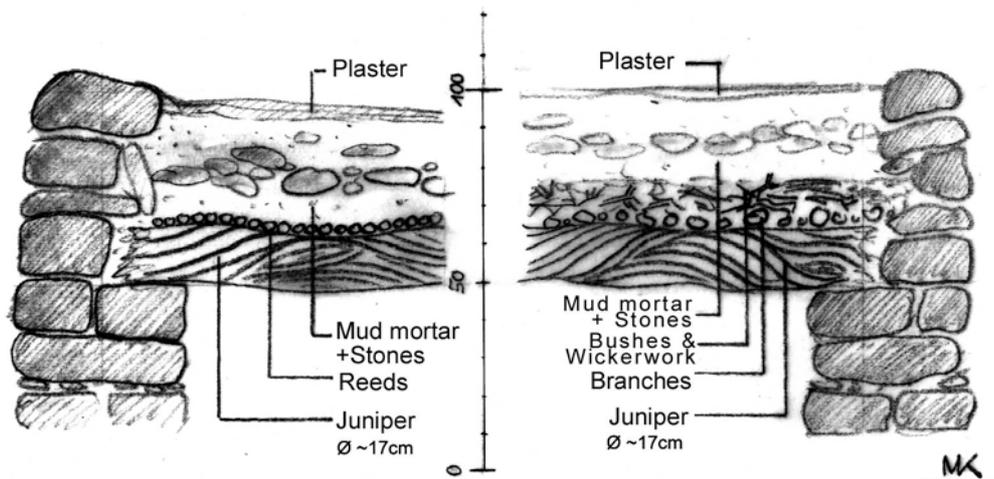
Rajif and Basta Old Villages. Two traditional roof constructions similar to Late PPNB constructions.
